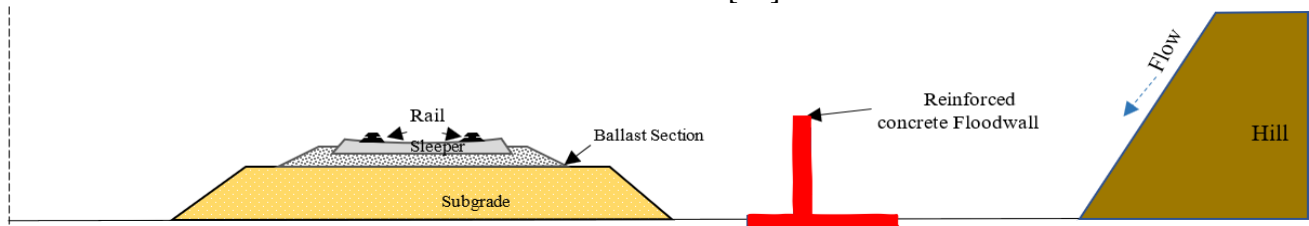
Schematic drawing of flood wall constructed on track side to face flooding.
